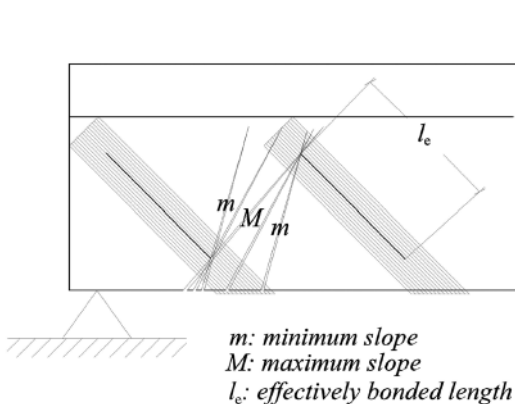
Field, defined by the minimum (m) and maximum (M) possible crack slope, where cracks can form without crossing the strips, due to excessive strip spacing. Cracks forming outside such field do activate the strips
